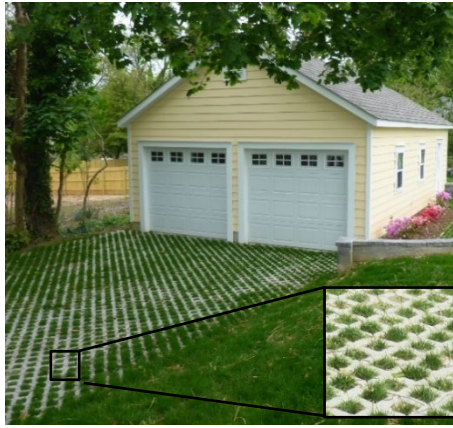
Pavement was removed and replaced with 720 square feet of turfstone permeable pavers at a residential property.
